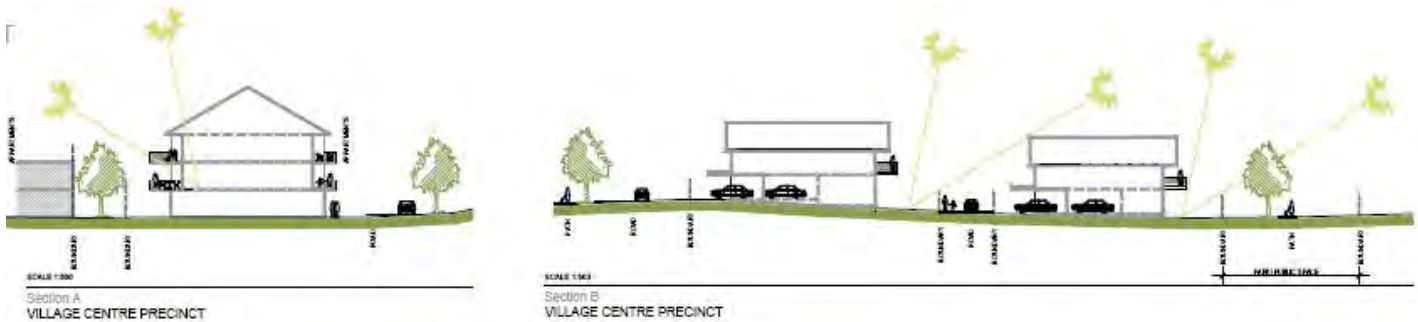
Cross sections of the Apartment and terrace buildings showing the vertical building envelopes (H+H Architects)
